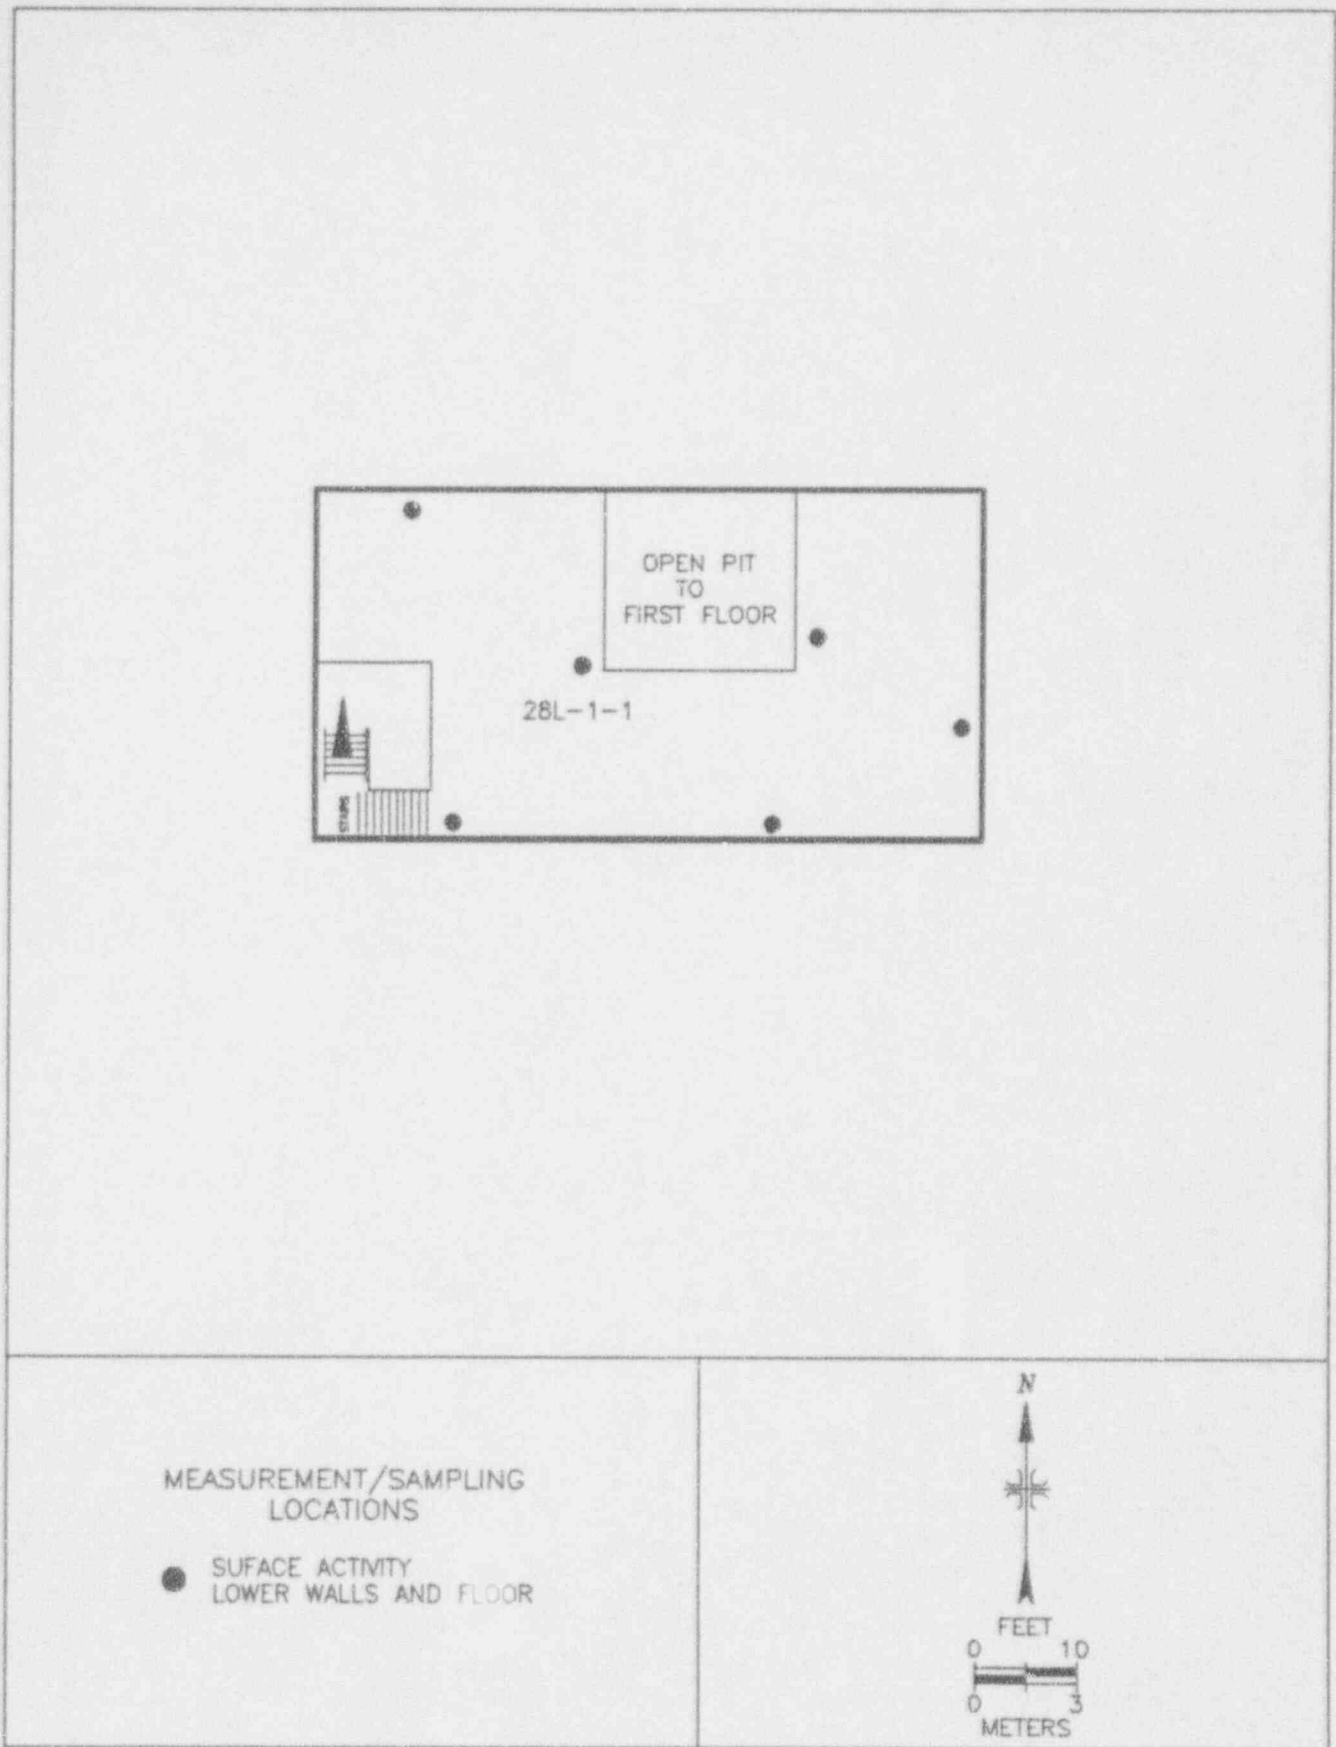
Building 12, Second Floor – Measurement and Sampling Locations
